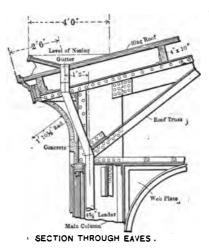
Pennsylvania Steel Company's New Bridge Plant.
